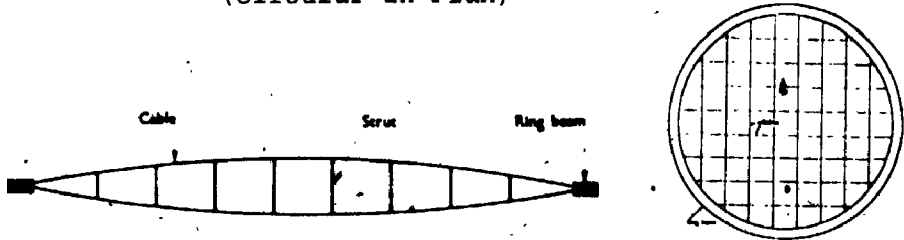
Cross-section of Convex Type Lens-shaped Roof
